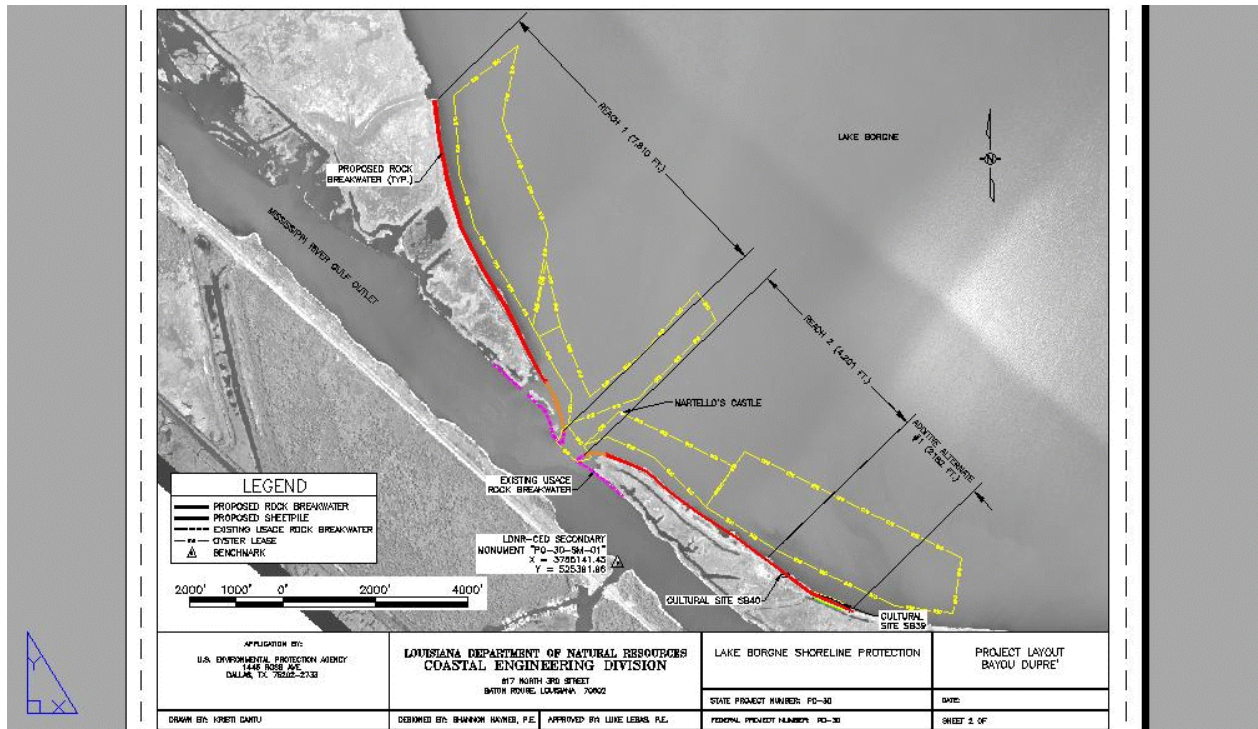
Bayou Dupre' Additive Alternate #1 (removed from final design)
